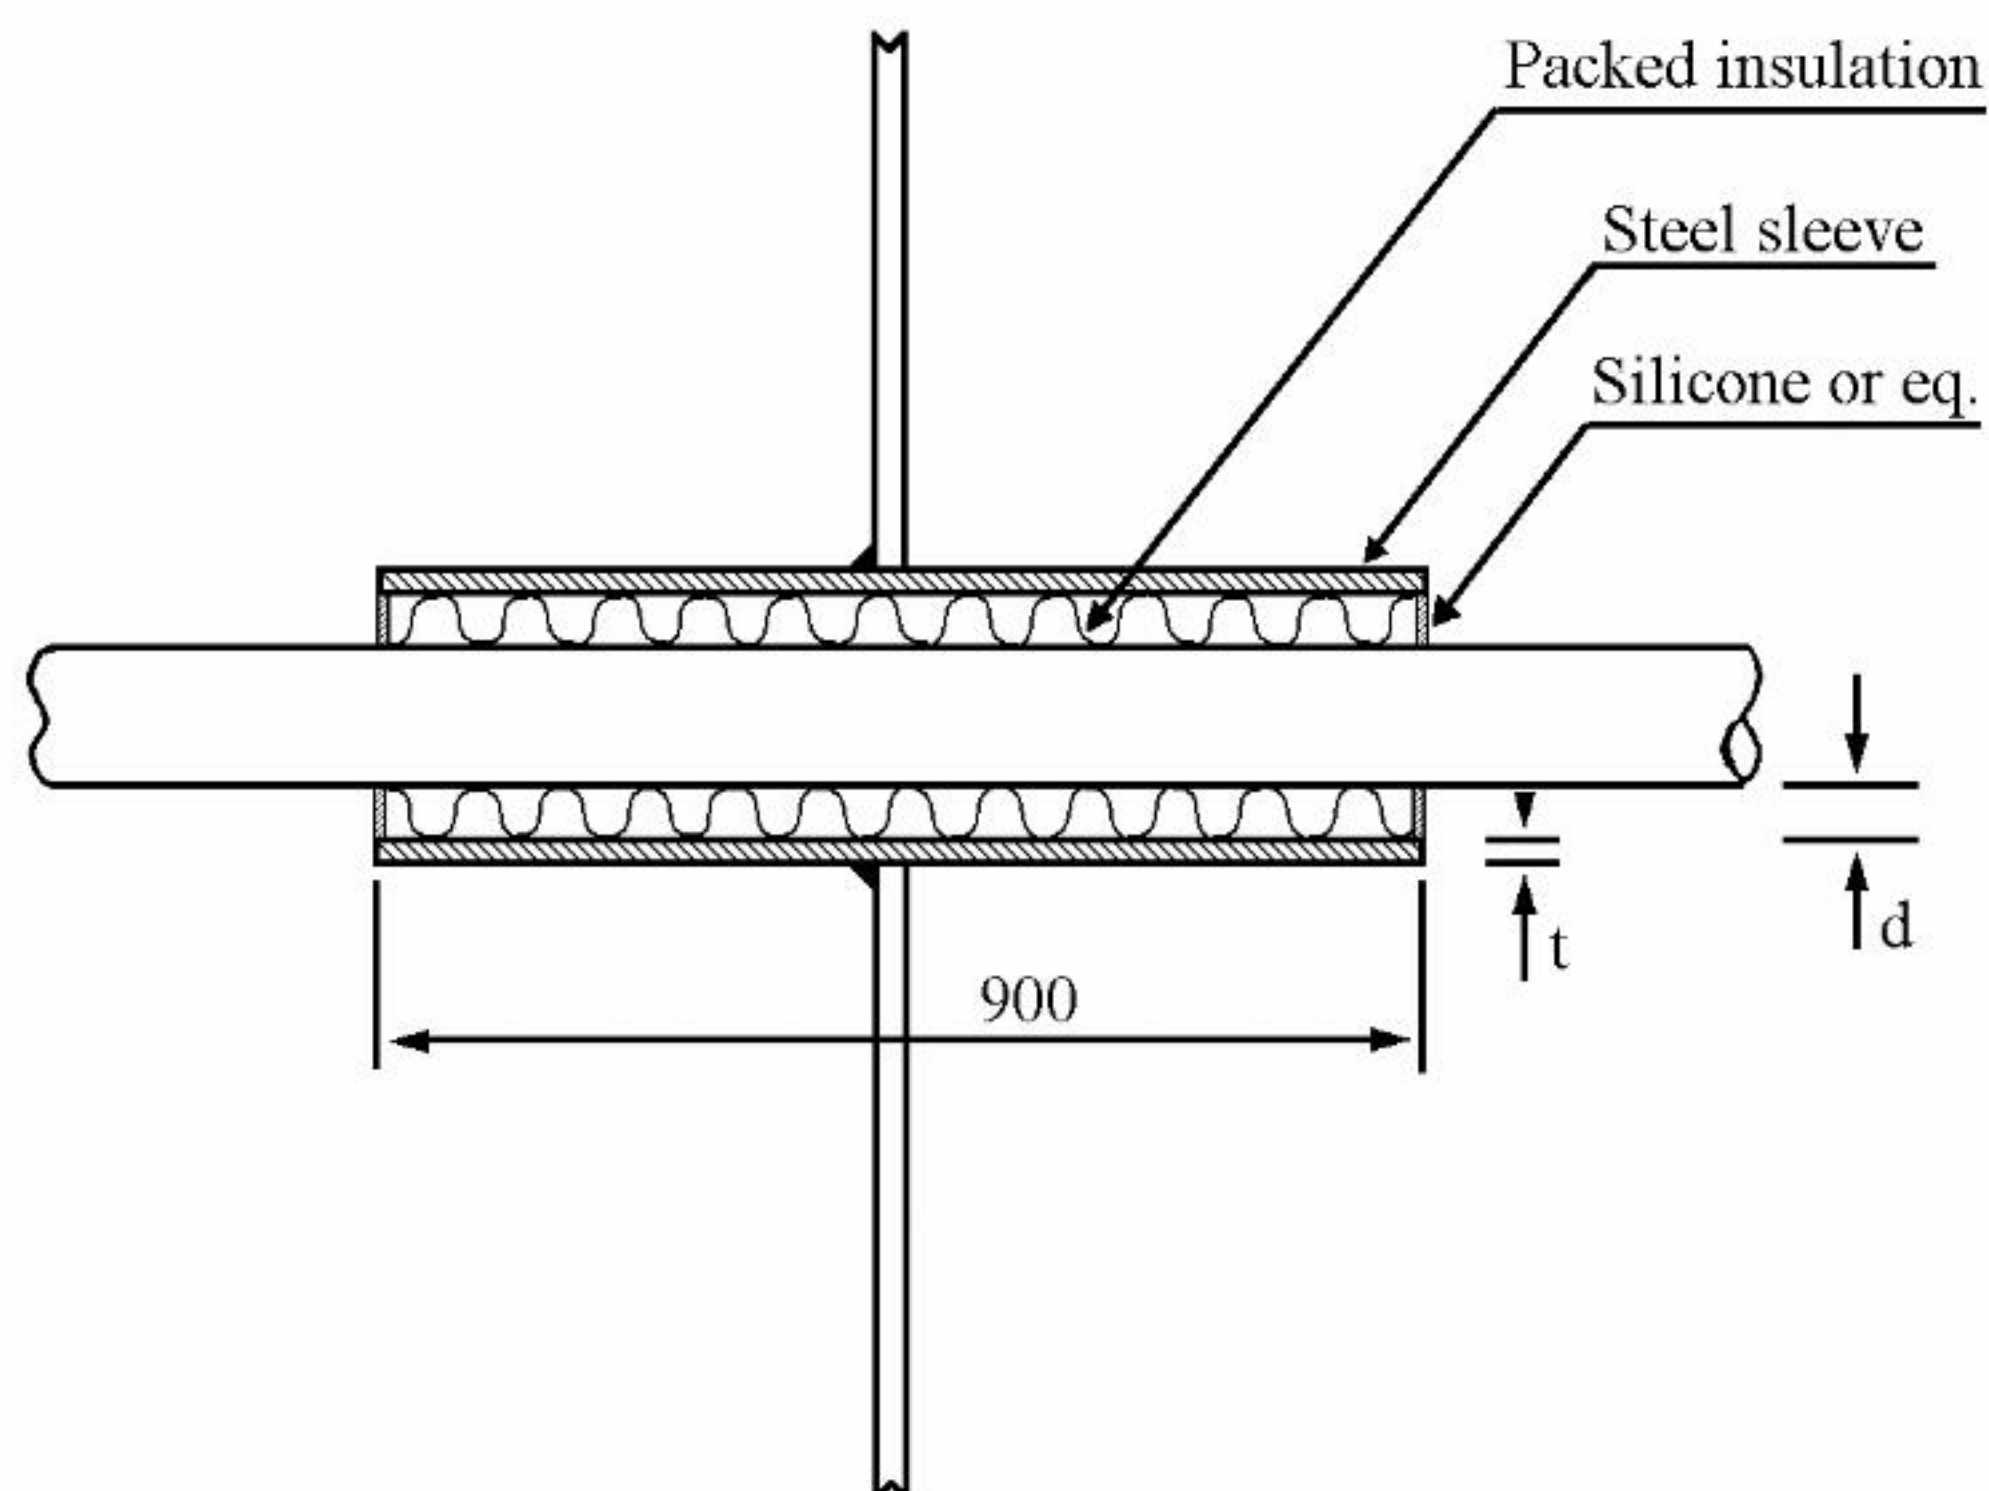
Pipes led through sleeves welded to the class A division
